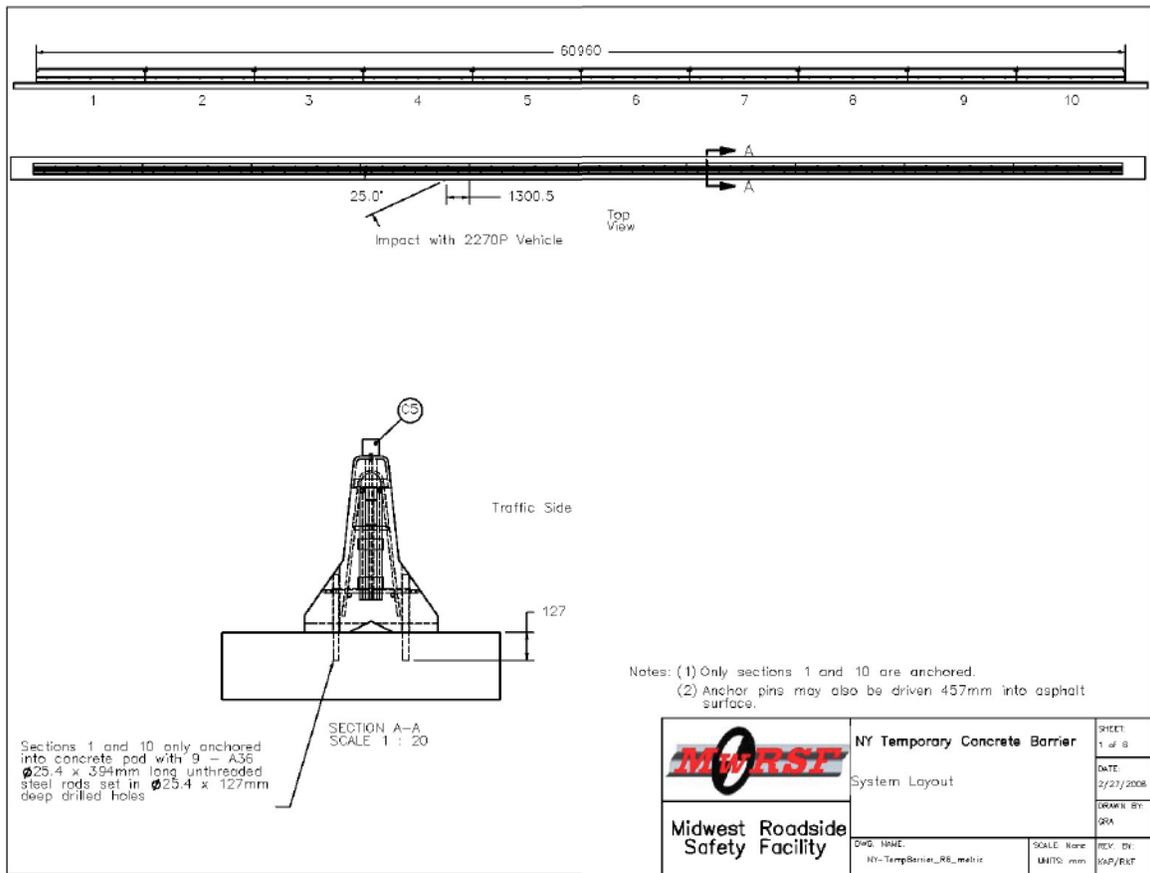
Unstiffened Temporary Concrete Barrier System Layout, Test NYTCB-2
